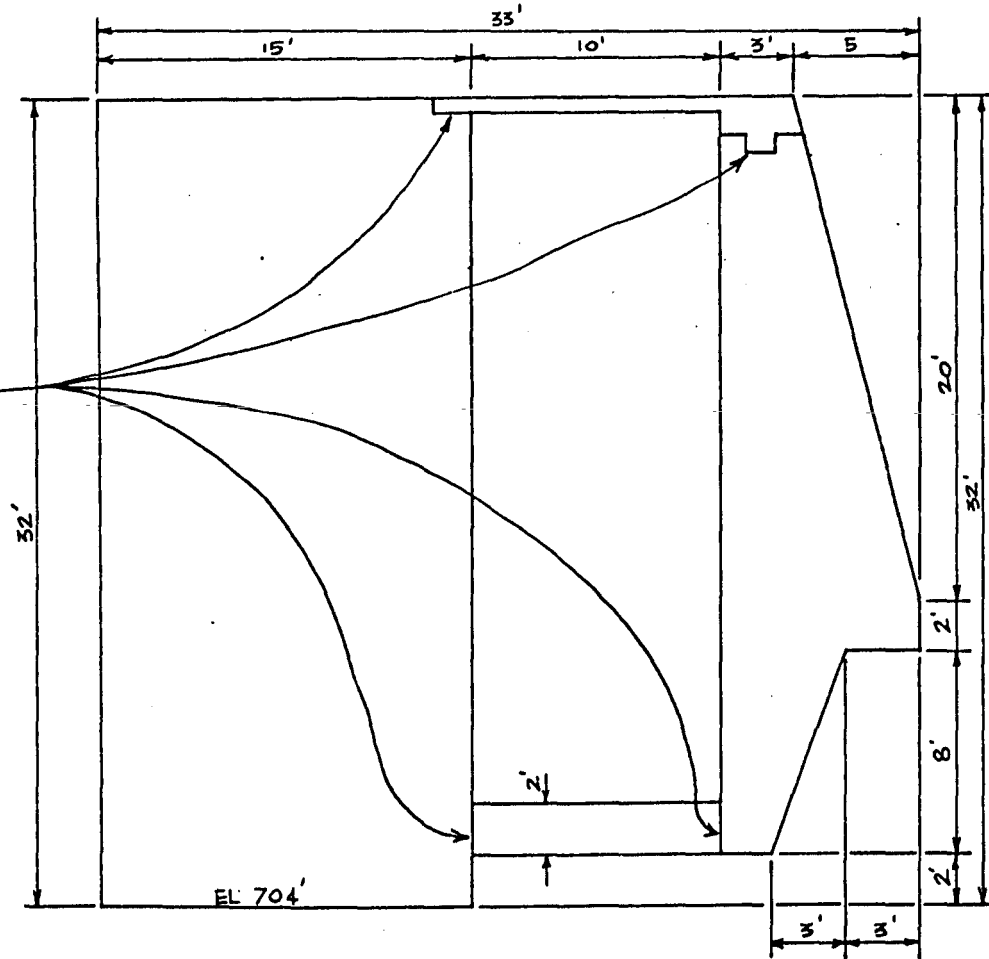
LAND WALL - LOCK CHAMBER L-32 W/ CONSTRUCTION JOINTS
